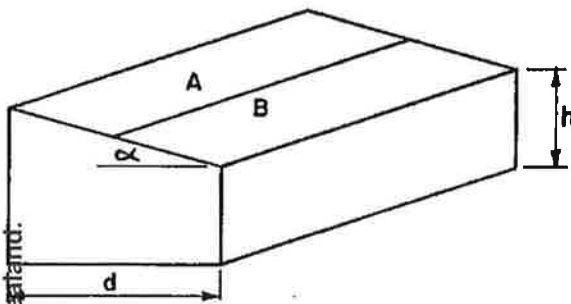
MONOSLOPE ROOFS OF CLAD BUILDINGS: NOTATION
